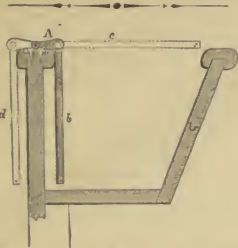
SECTION OF MANGER AND FOLLOWER.
